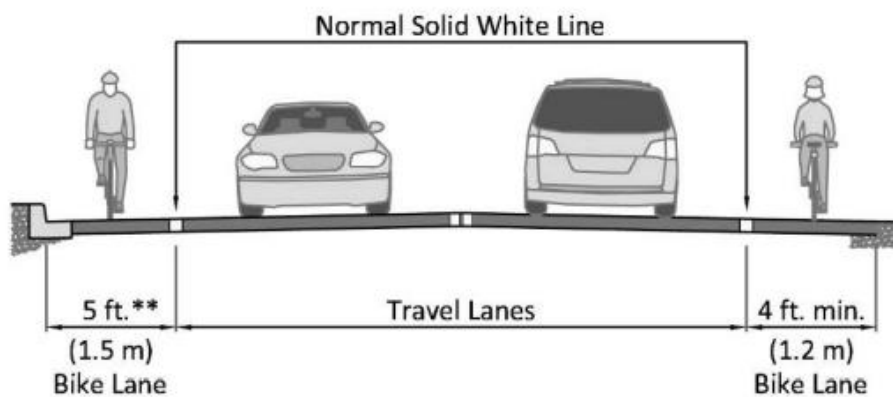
Typical Bike Lane Cross Sections When On Street Parking Is Prohibited (AASHTO, 2012).
